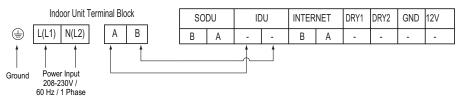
Simplified View of Indoor Unit Terminal Connections—Ceiling Suspended.
